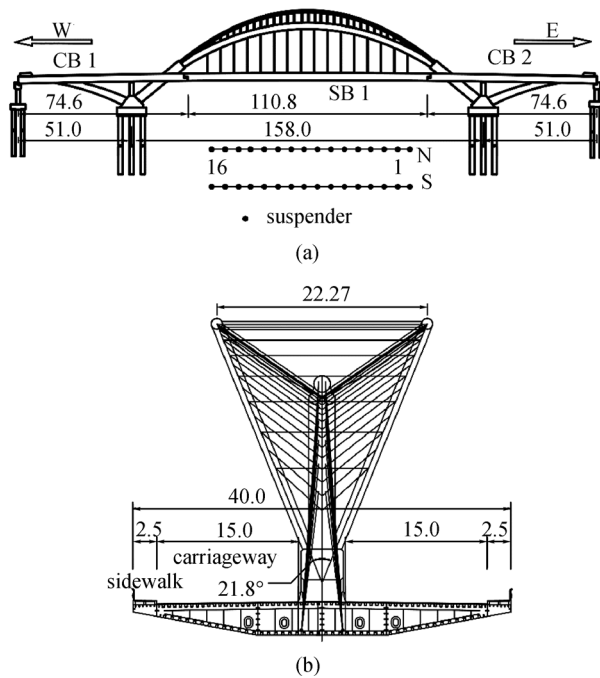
Bridge layout (unit: m). (a) Elevation view; (b) side view.
